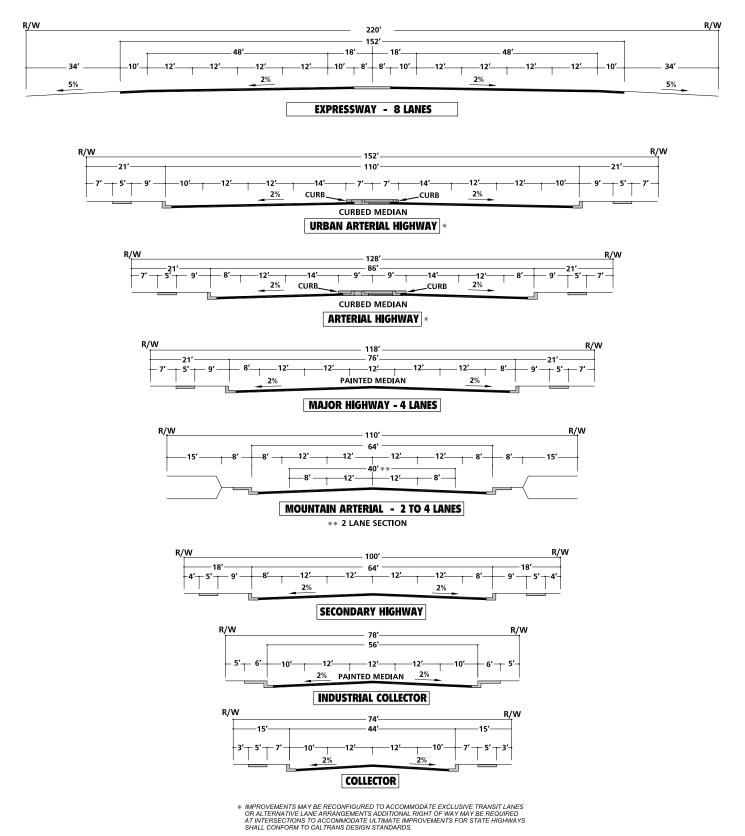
COUNTY OF RIVERSIDE GENERAL PLAN ROADWAY CROSS-SECTIONS
